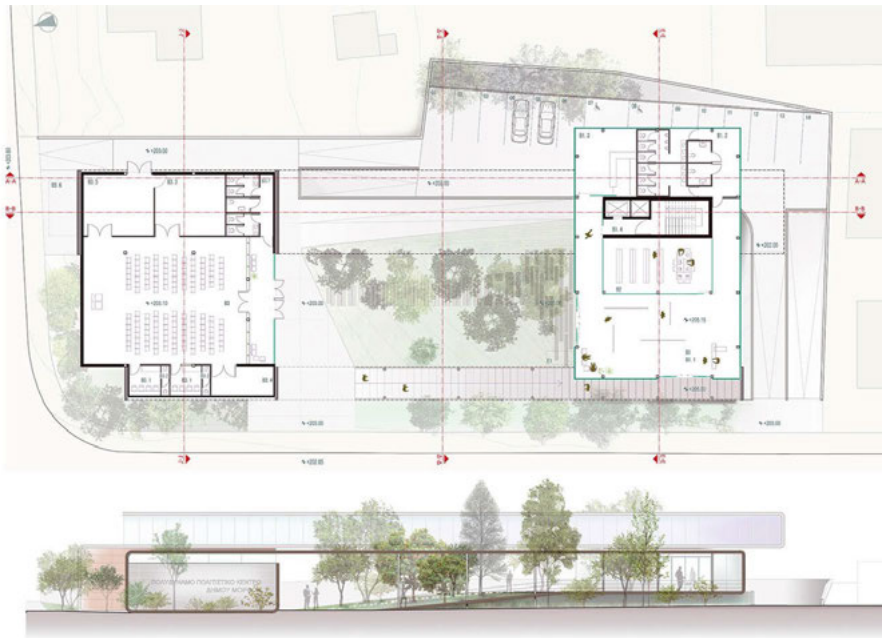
Ground floor plan and longitudinal section of the building complex. Source: (Authors 2012)
